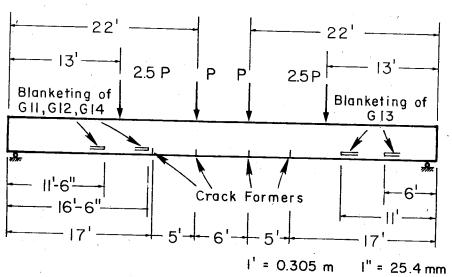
Location of blanketing tubing and crack formers relative to position of loading points.
